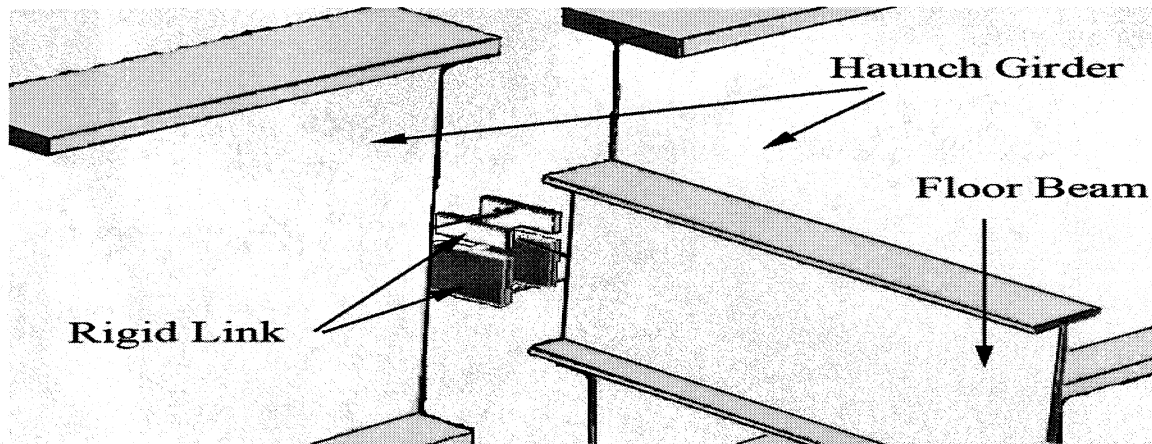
6 shows a typical floor system for an approach span. Stringers bear on floor beams that are connected to plate girders. The bottom flanges of the approach stringers are connected to the top flanges of the floor beams through a bolted connection. A rigid link connects the stringer mid-height to the corresponding floor beam mid-height. The rigid link that connects these two members has a pinned connection at the stringer joint because internal moments in the stringer are not assumed to be transferred through this connection into the floor beam; only forces are transferred. The fixed end of this rigid link – at the floor beam mid-height – preserves internal moments in the floor beam generated by eccentricity between the stringer and the floor beam. Figure 2 - 8 illustrates a typical approach floor system represented in the finite element model. Beam and shell elements are shrunk twenty percent to clarify model geometry.
